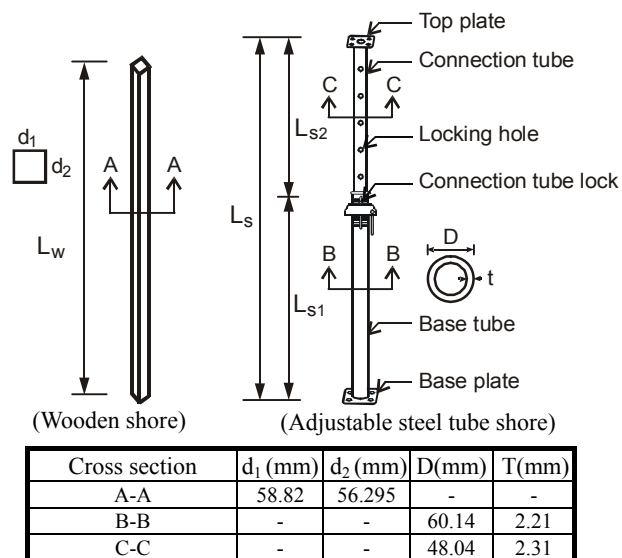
Dimensions of Wooden Shore and Adjustable Steel Tube Shore
